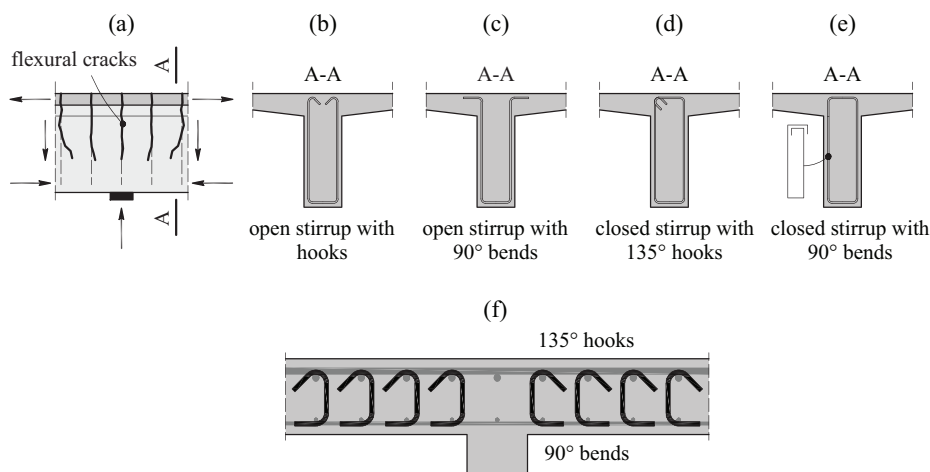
Applications of bends and hooks for: (a) - (e) shear reinforcement in bridges; and (f) for punching or shear reinforcement in slab.
